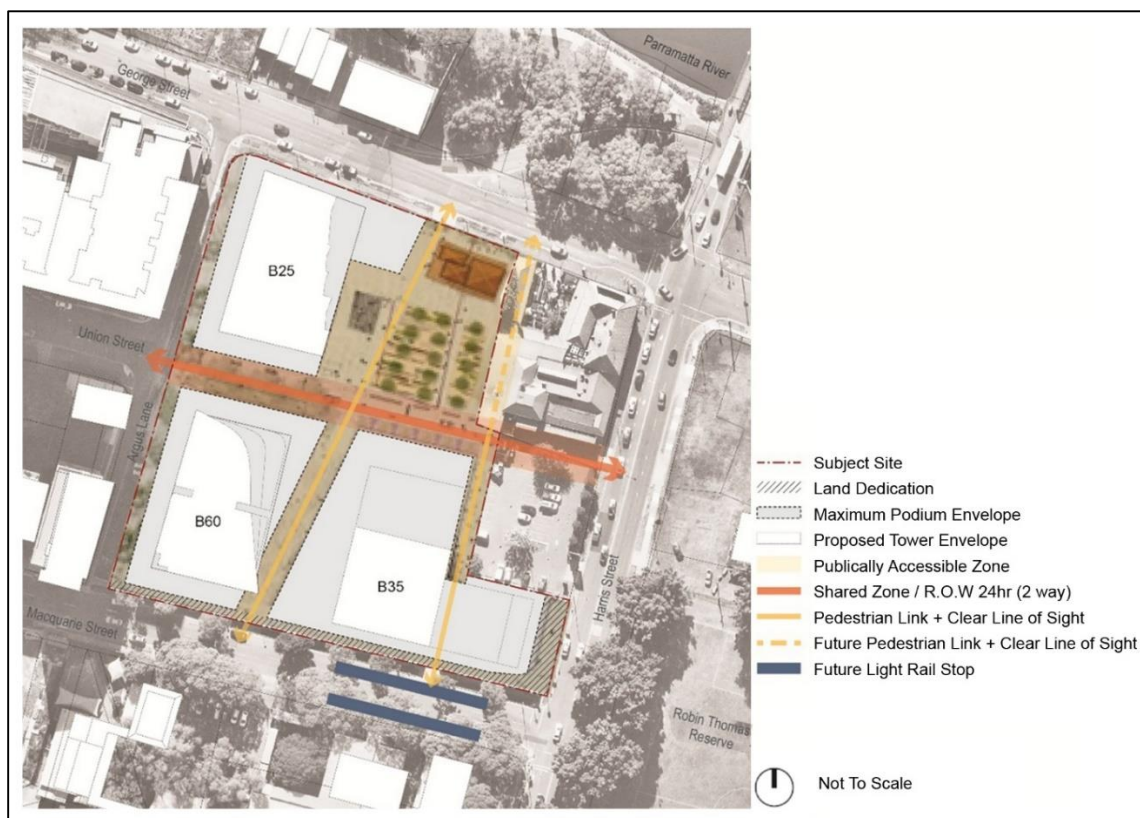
Master plan diagram for 142-154 Macquarie Street
